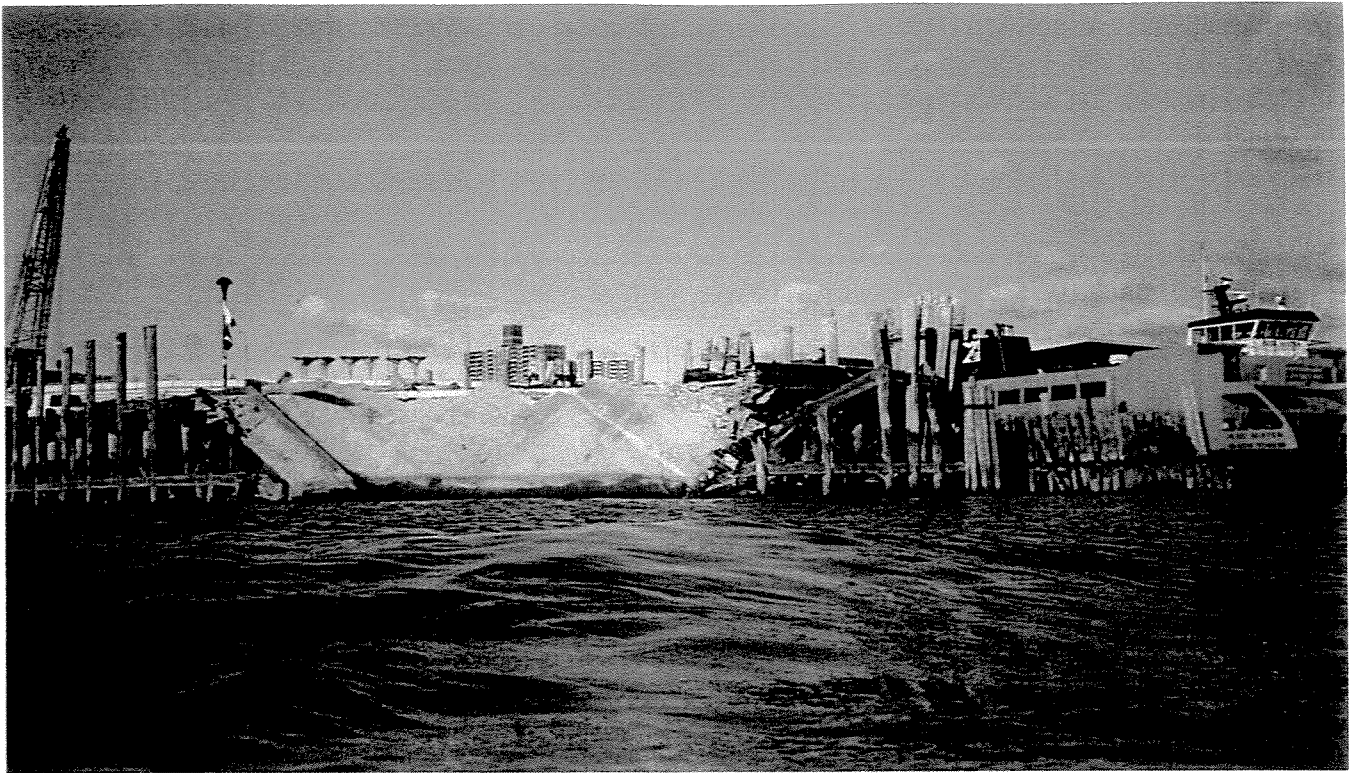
General view of pier with collapsed SE corner, looking NW.
